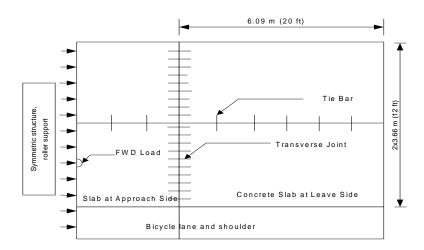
PlanView of Pavement Model with Symmetric Roller Support
